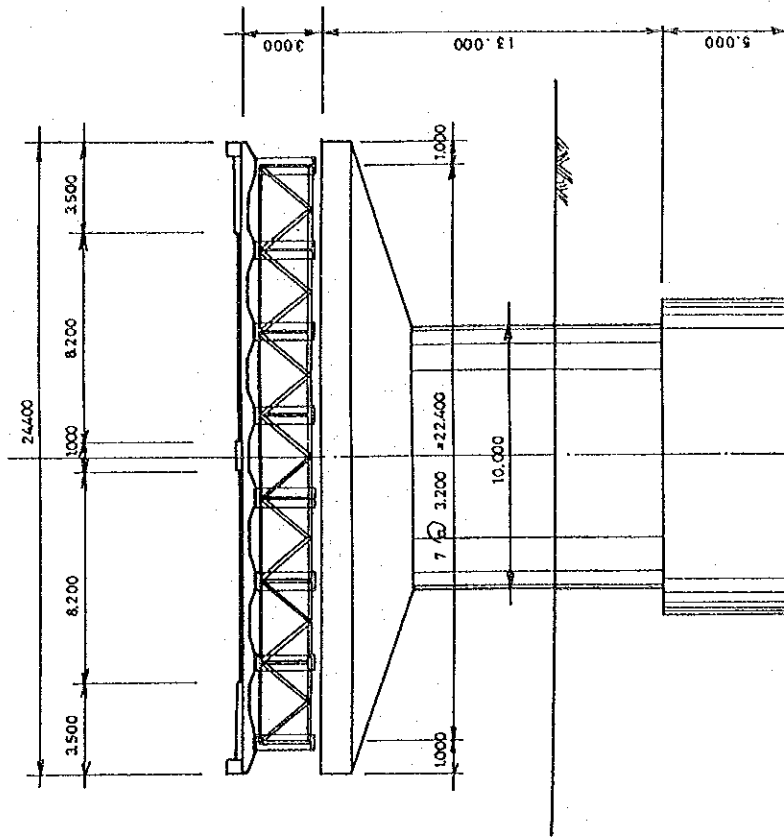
Continuous Steel Plate Girder with Hammer-head Pier on Pile Foundation
